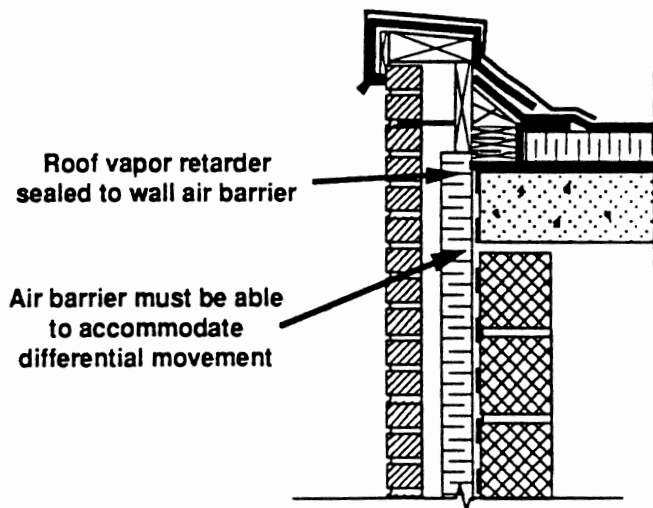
Masonry Wall/Roof Edge - Concrete Frame (Burn)
